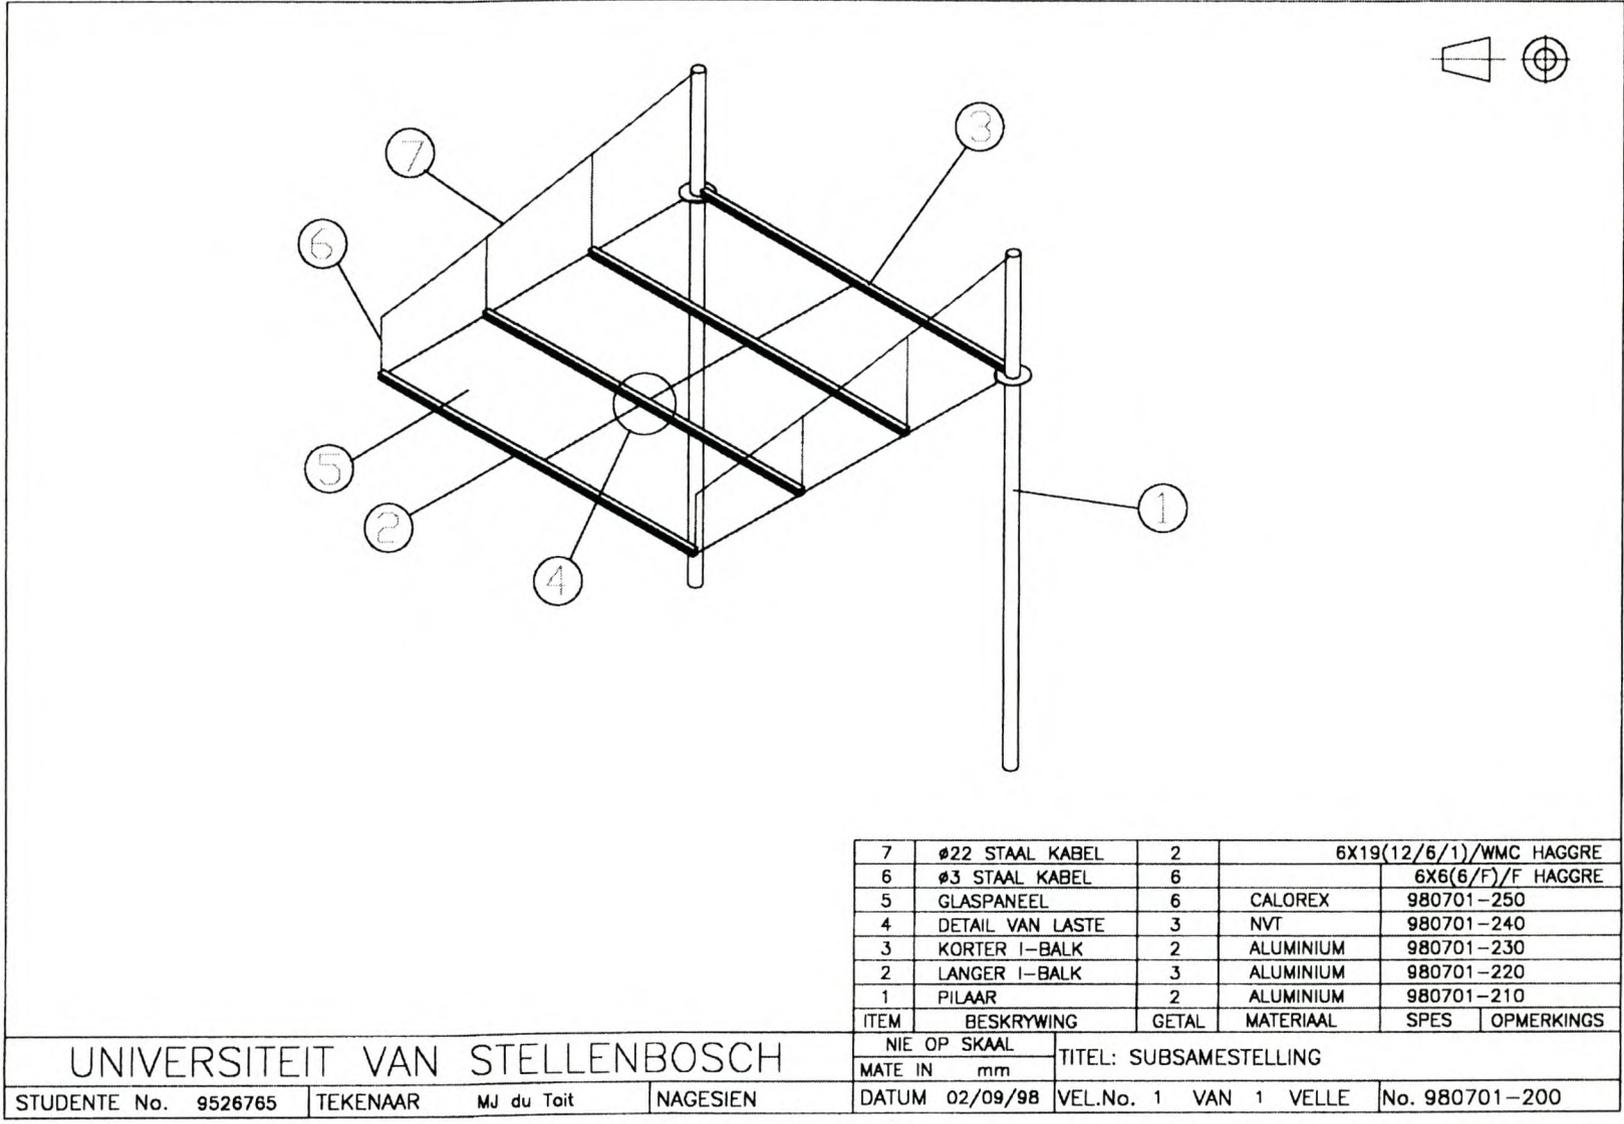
Solar Chimney Collector, Technical Drawing #4 [Roux et al., 1998]
